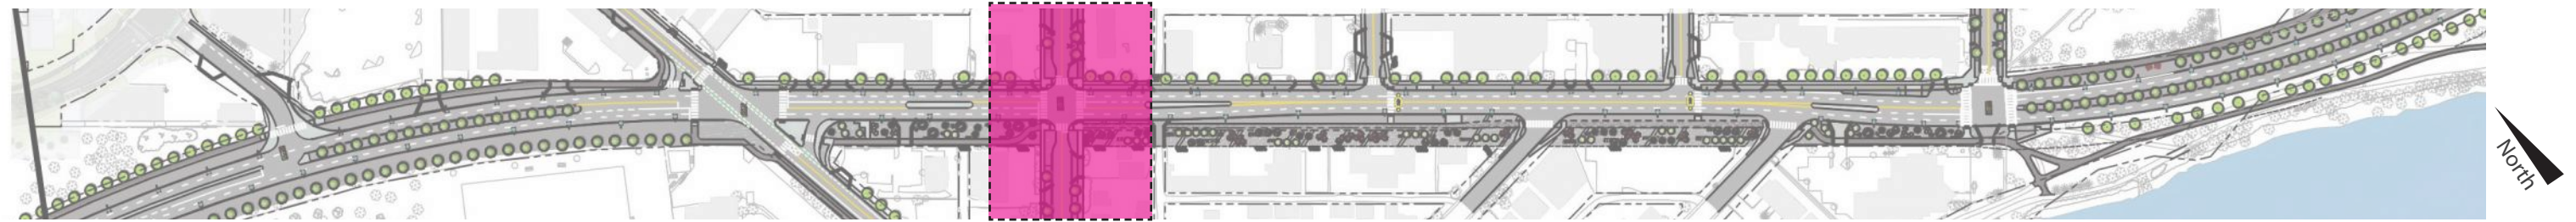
SECTION 'CC' TYPICAL MAIN STREET CROSS SECTION - MEDIUM TERM (WITH BYLAW SETBACK)
